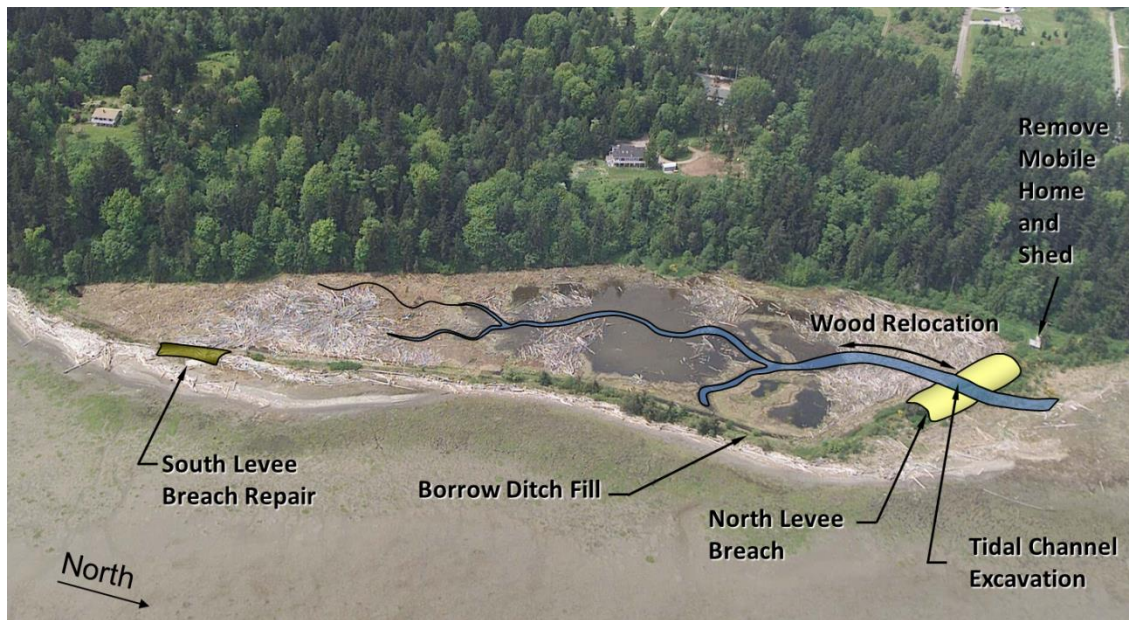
Map of restoration plan outlining major components of the project. Note: plans are not drawn to scale.
